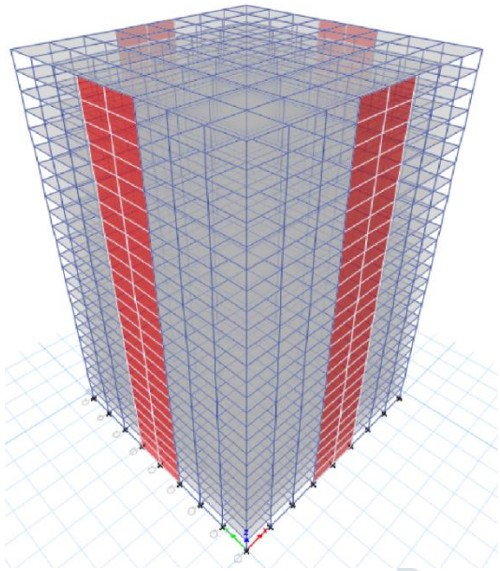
3-D view of structure with Composite shear wall provided at side centre
